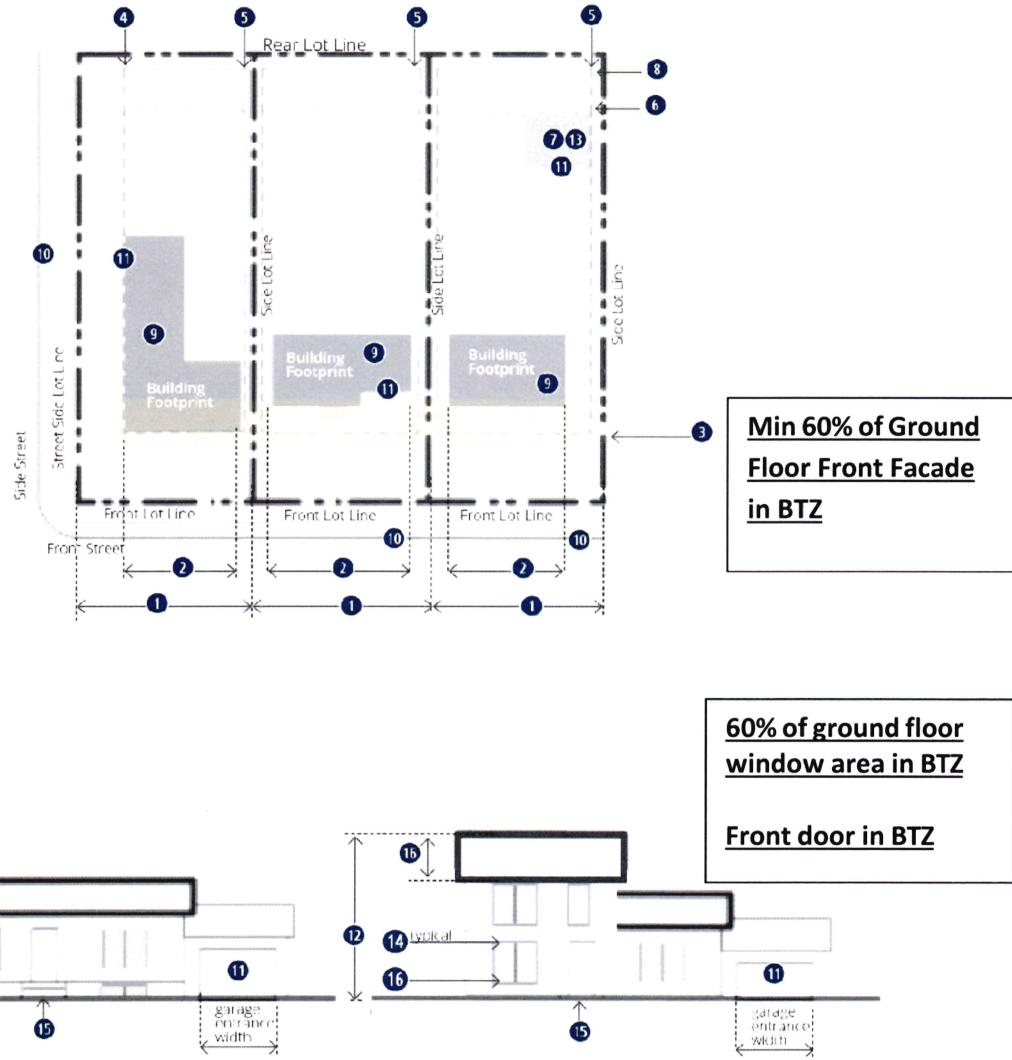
(2). N2 district diagrammatic plans and elevations.
